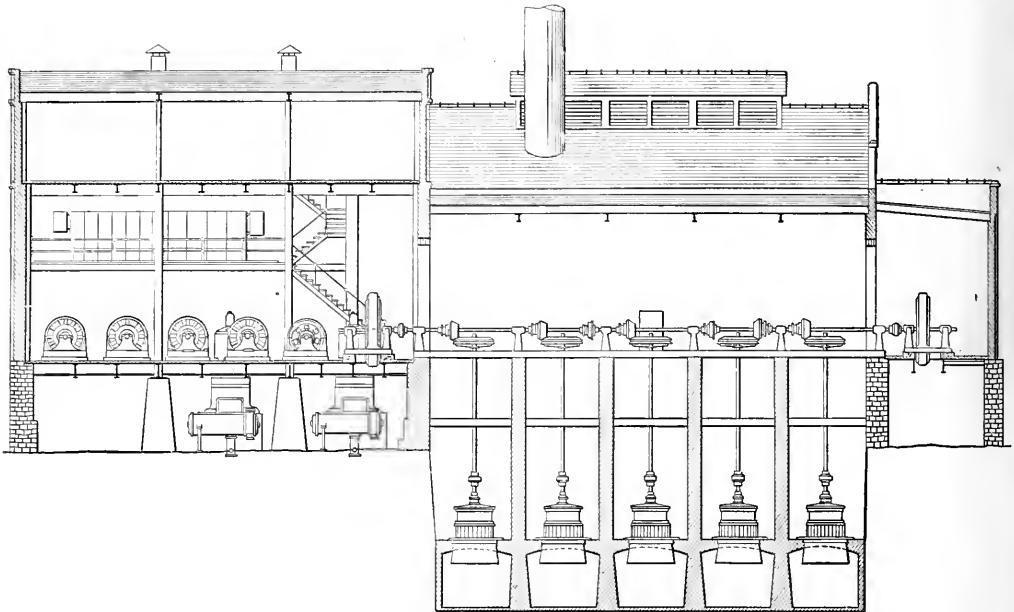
SECTIONAL ELEVATION OF POWER HOUSE.
